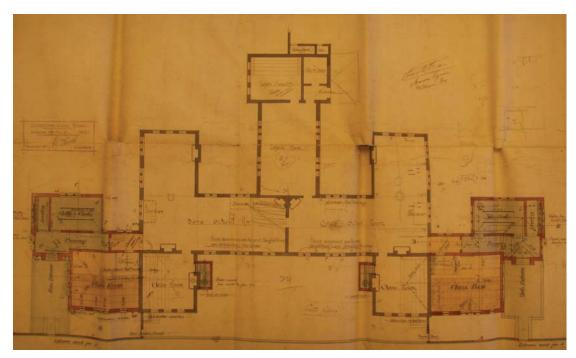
Detailed plan of the proposed additions, 1891 (CRO(B) Z1041 1875-1904)
